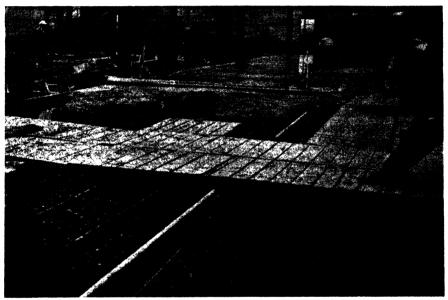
Pouring floor slab in sections. (A. O. Smith Corporation.)
